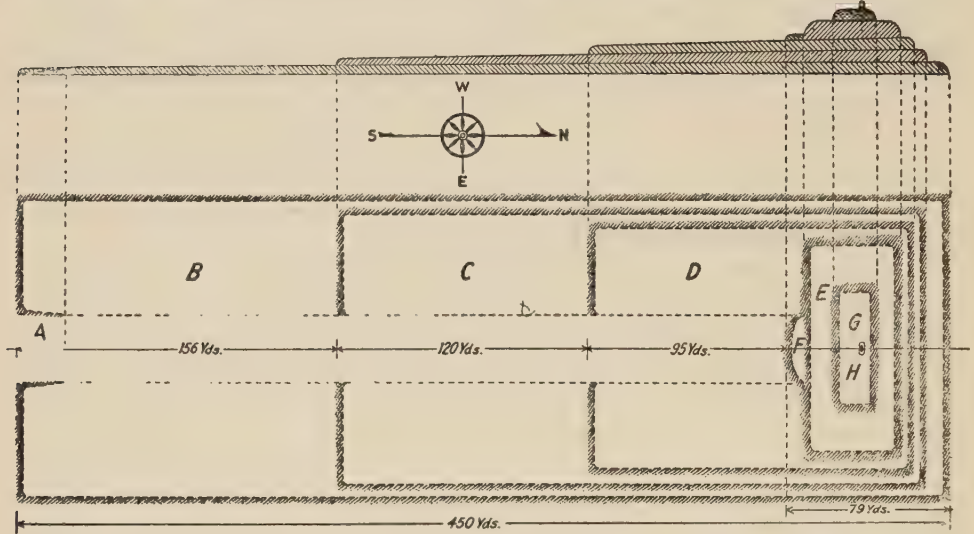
PLAN AND ELEVATION OF WEI YANG KUNG PALACE FOUNDATION-MOUND,
